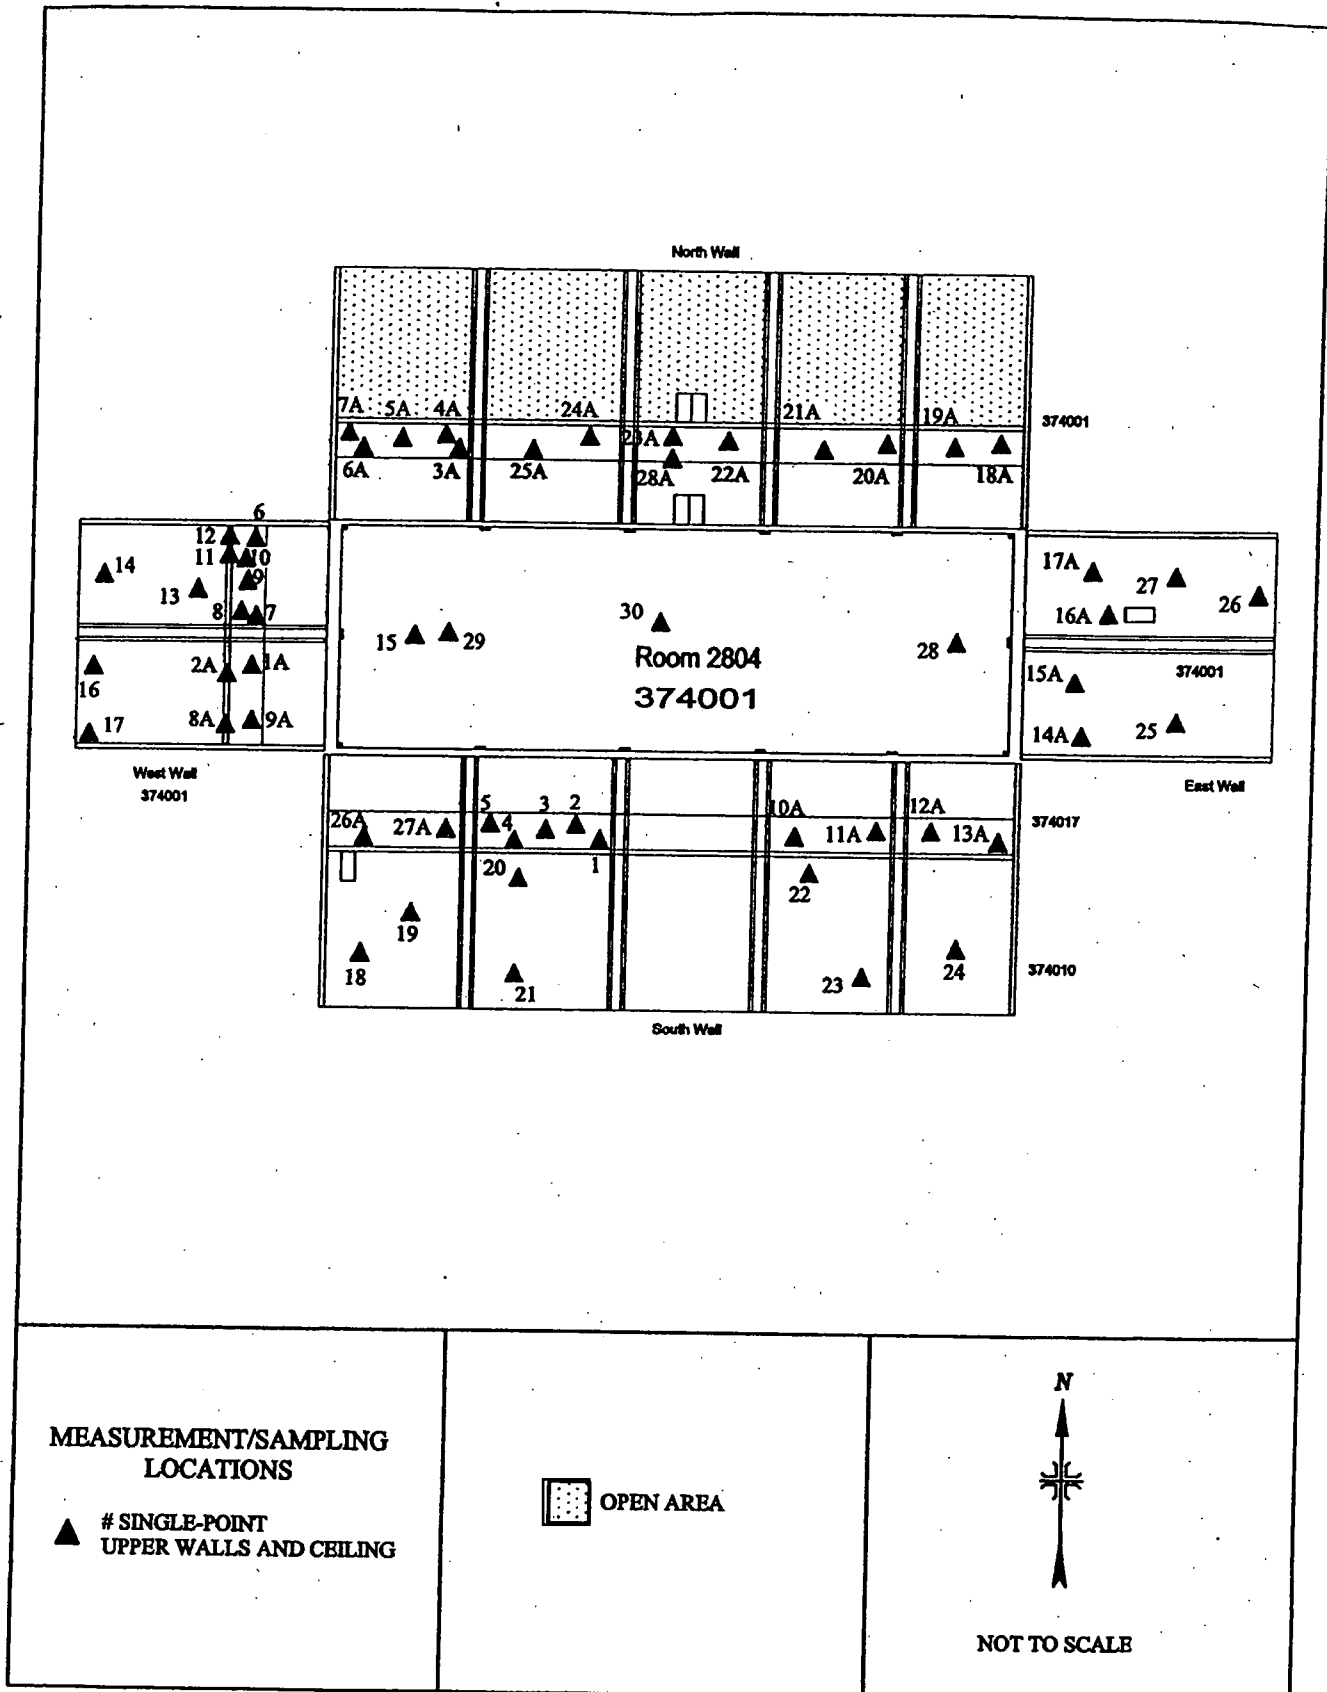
Room 2804 - Upper Walls and Ceiling - Measurement and Sampling Locations
